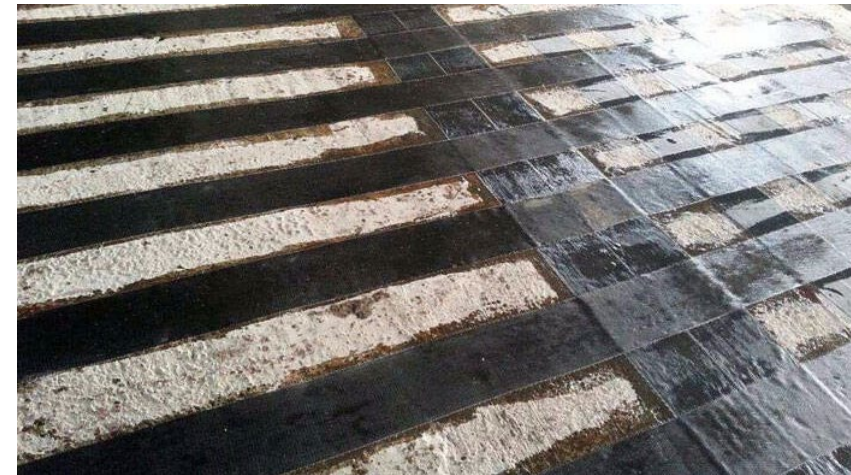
Damage happens to the floor diaphragm after the Kaikoura earthquake (*Henry et al., 2017*)
